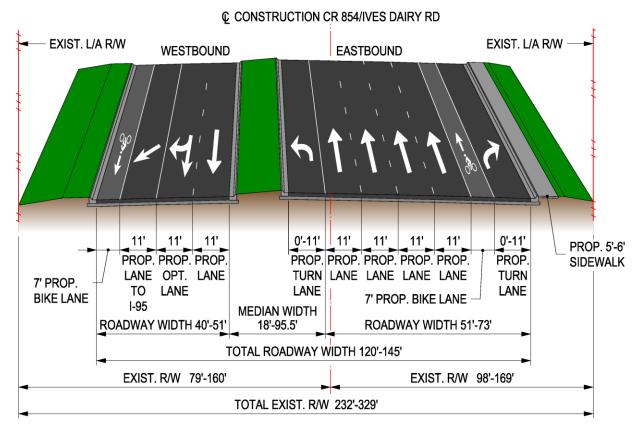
15: Proposed Typical Section - Alternative 3 - CR 854/Ives Dairy Road
